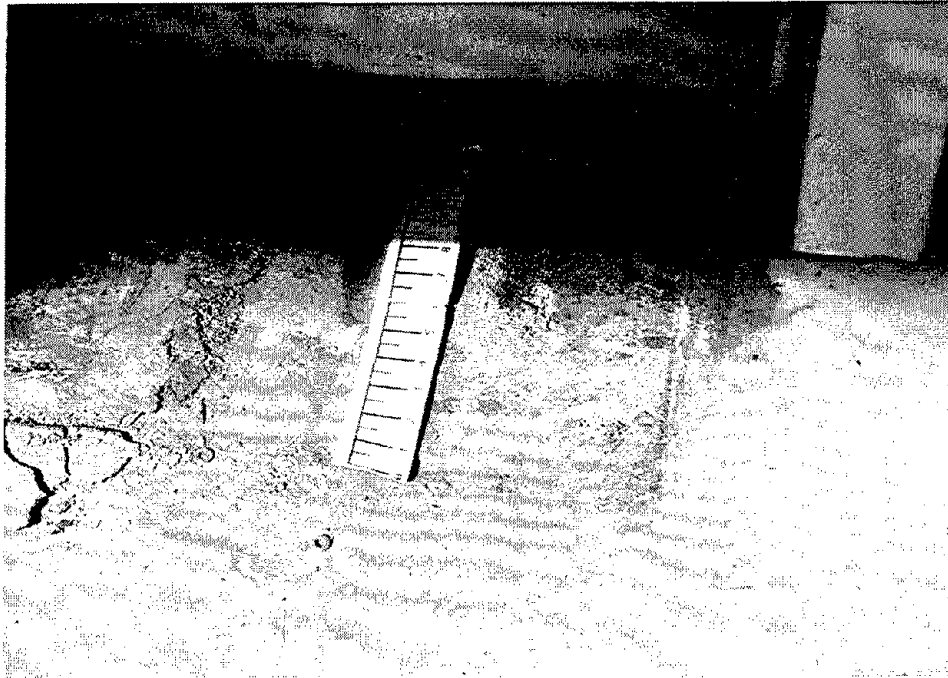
Transformer weld failed and transformer moved 14".
